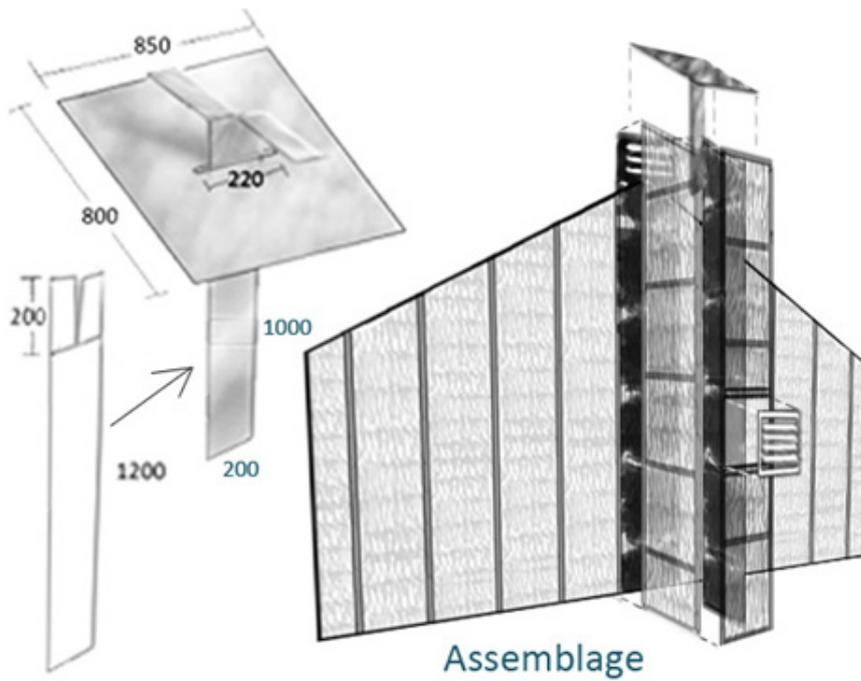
Assemblage ; left image shows dimensions for corrugated iron
